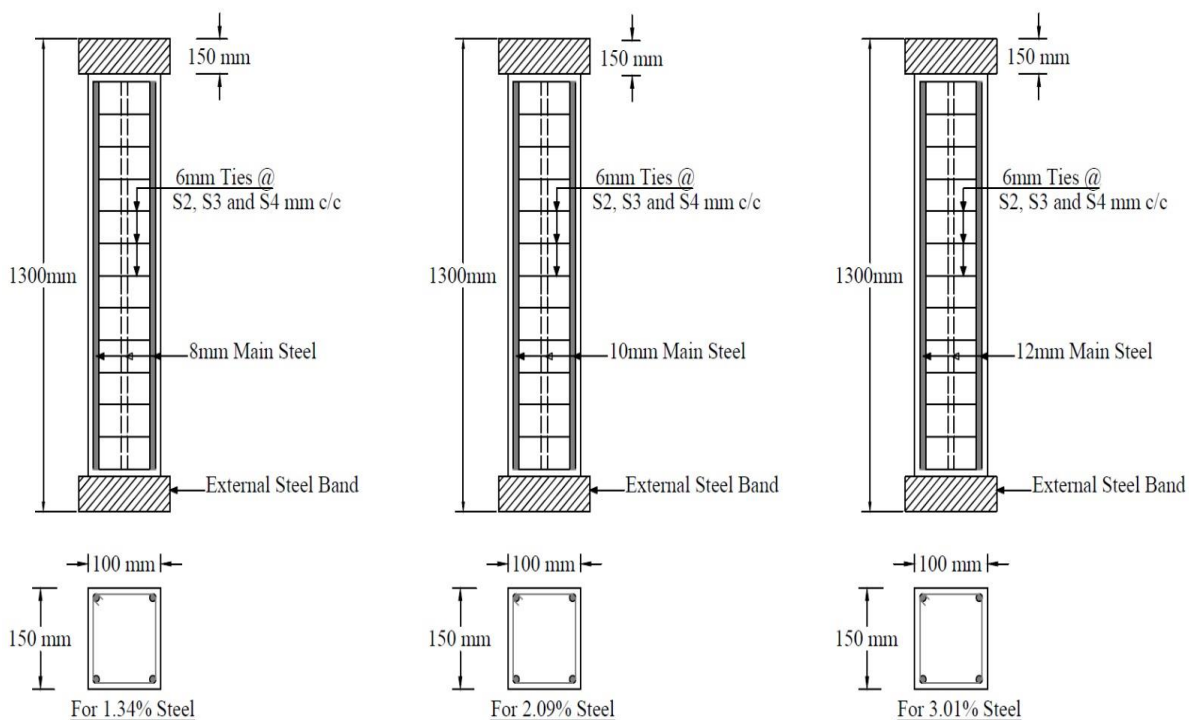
Reinforcement details and test set up of eccentrically loaded column
